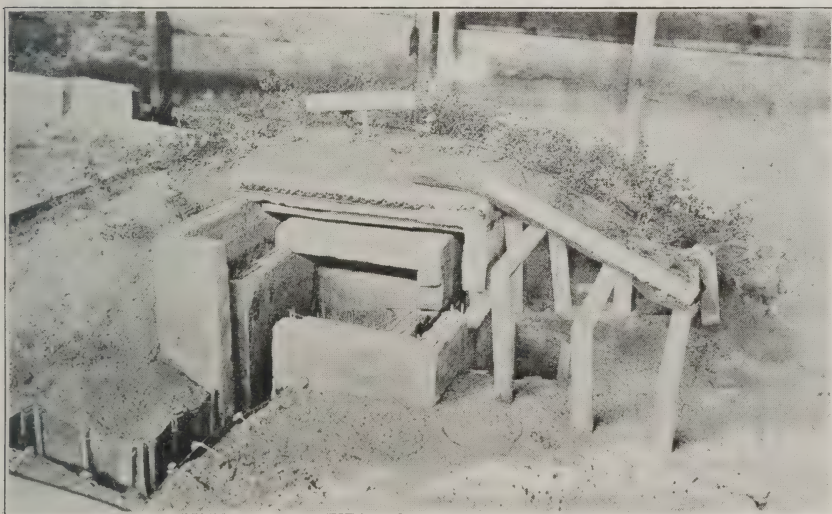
Machine Gun Emplacement. Reinforced concrete double walls, roof, and air space.
